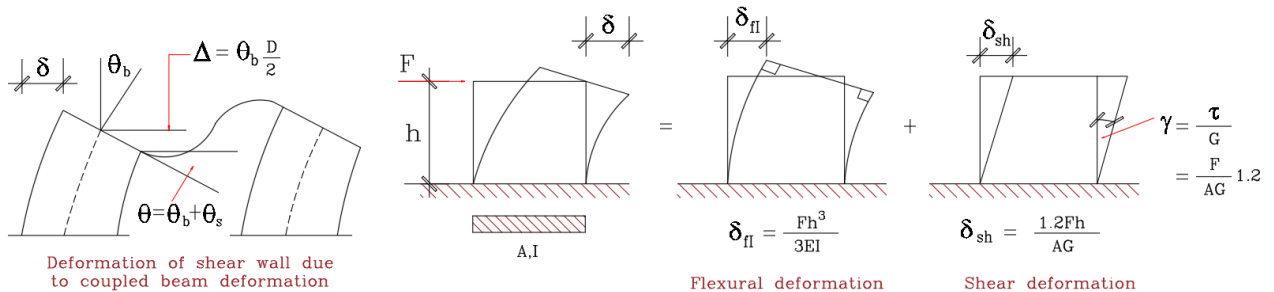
Structural wall mechanism (Lignos, 2015)
